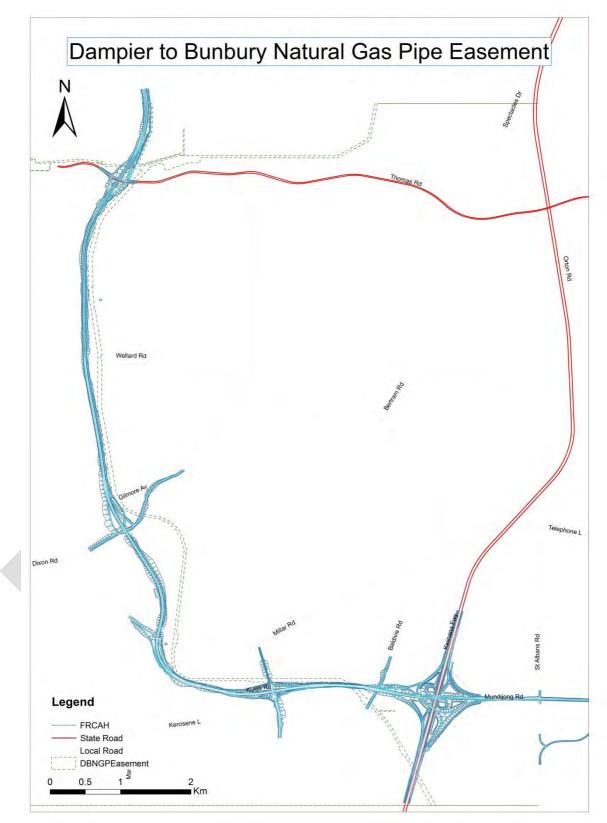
Dampier to Bunbury Gas Pipe Corridor
